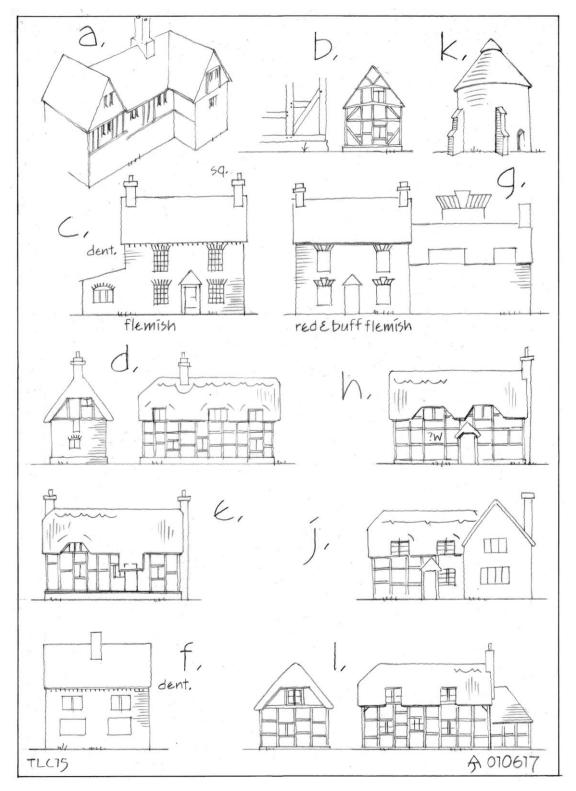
; Architectural Context; see HE plan for locations of buildings a-l
